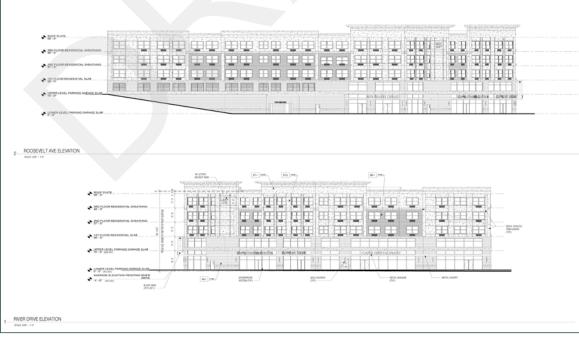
Conceptual Building Elevations Courtesy of Mistry Design
